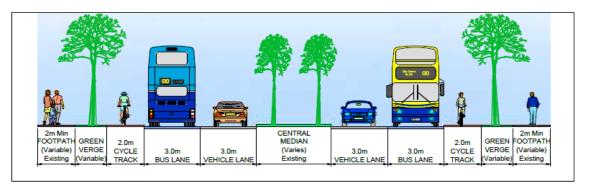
Alternative Proposed Road Cross-Section in Section 1
